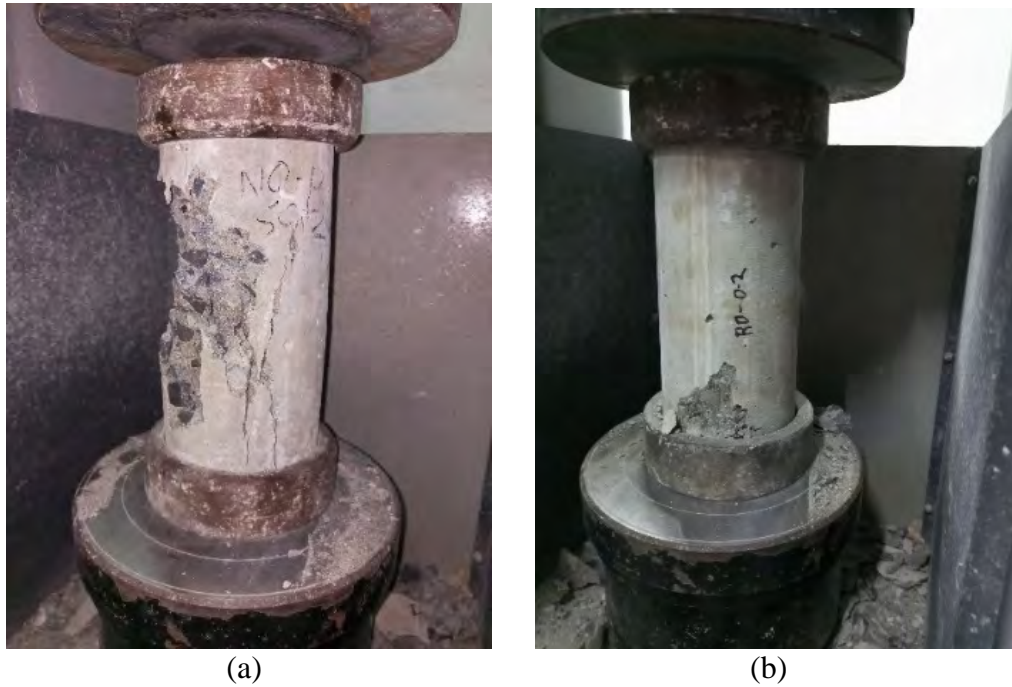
Failure pattern under compressive load (a) concrete cylinder without fiber (b) concrete cylinder with nylon fiber
